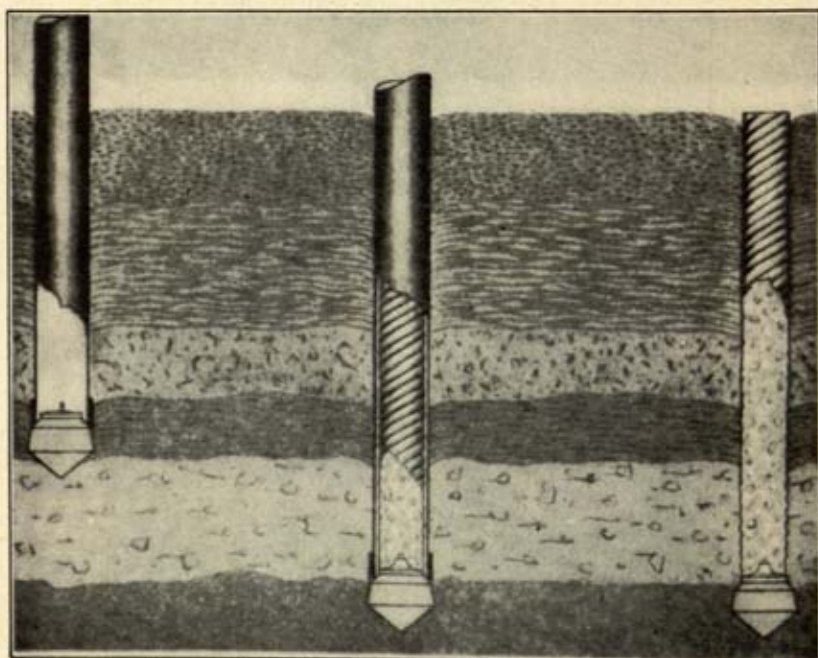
Steps in driving button-bottom piles. (Western Foundation Corp.)
